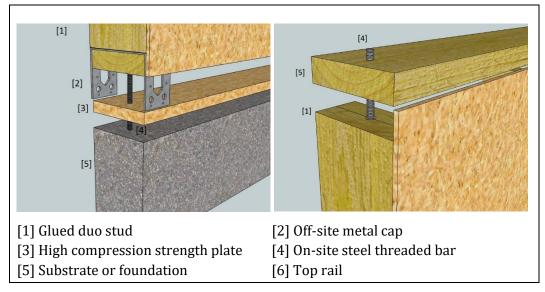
Post-tensioned wall on-site threaded-bar installation
